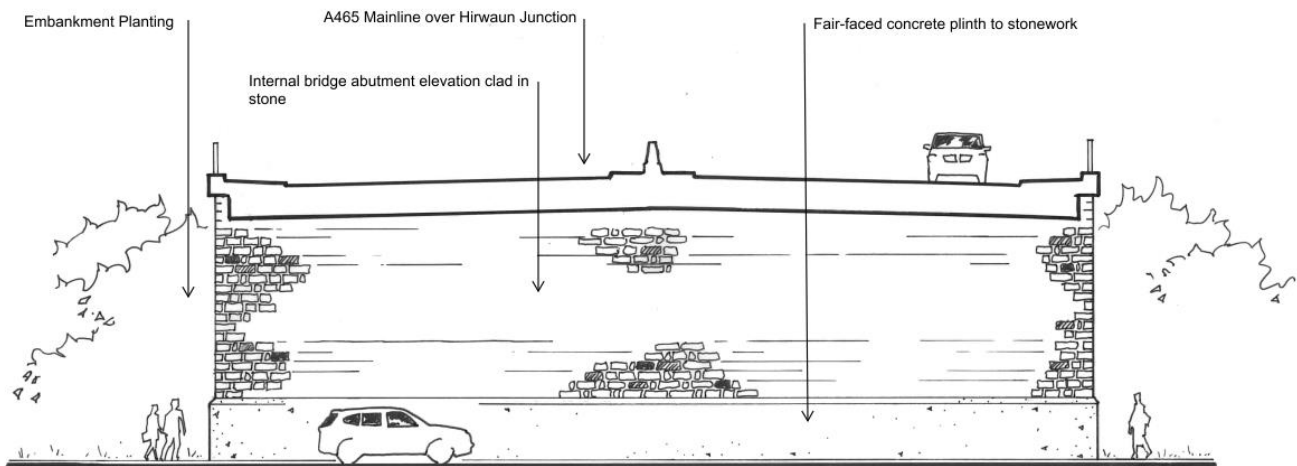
Internal Hirwaun junction bridge elevation (not to scale)
